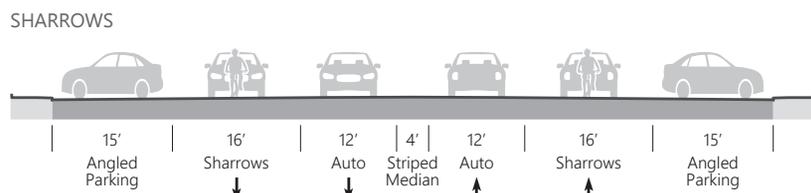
PACIFIC BOULEVARD - EXISTING CROSS-SECTION
